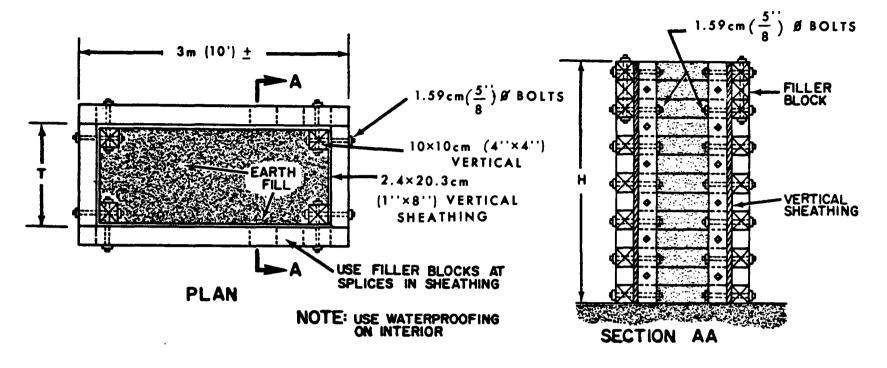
Prefabricated dimensioned timber crib constructed bulkhead revetment.
